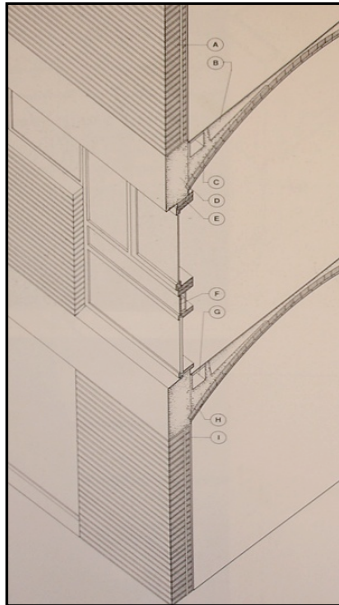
Maisons Jaoul, Wall Section, 1951-1955 Le Corbusier's masonry wall consisted of a 22 cm exterior width, 3.5 cm air space, and a 2 cm interior brick and despite their monumental appearance, the walls are cavity walls with an air space to intercept any water and provide insulation (Ford, 1997, p.214).
